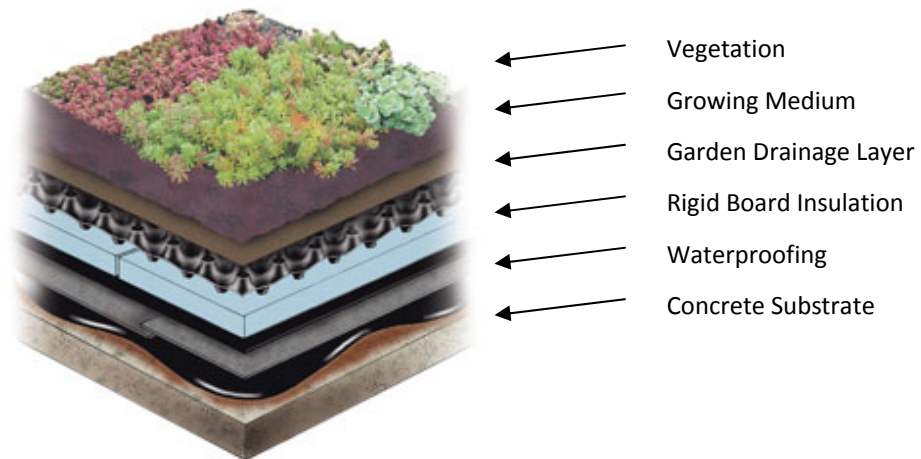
Typical extensive green roof assembly provided by American Hydrotech, Inc.
